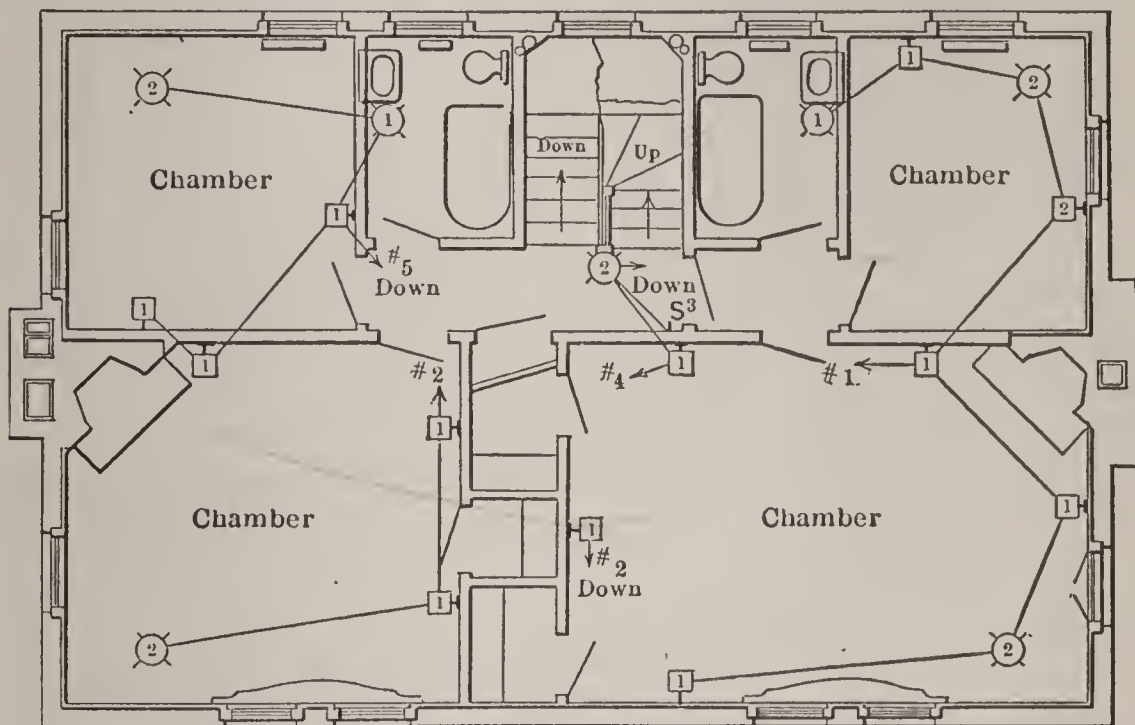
Lighting Installation for a Residence. Second-floor plan.
